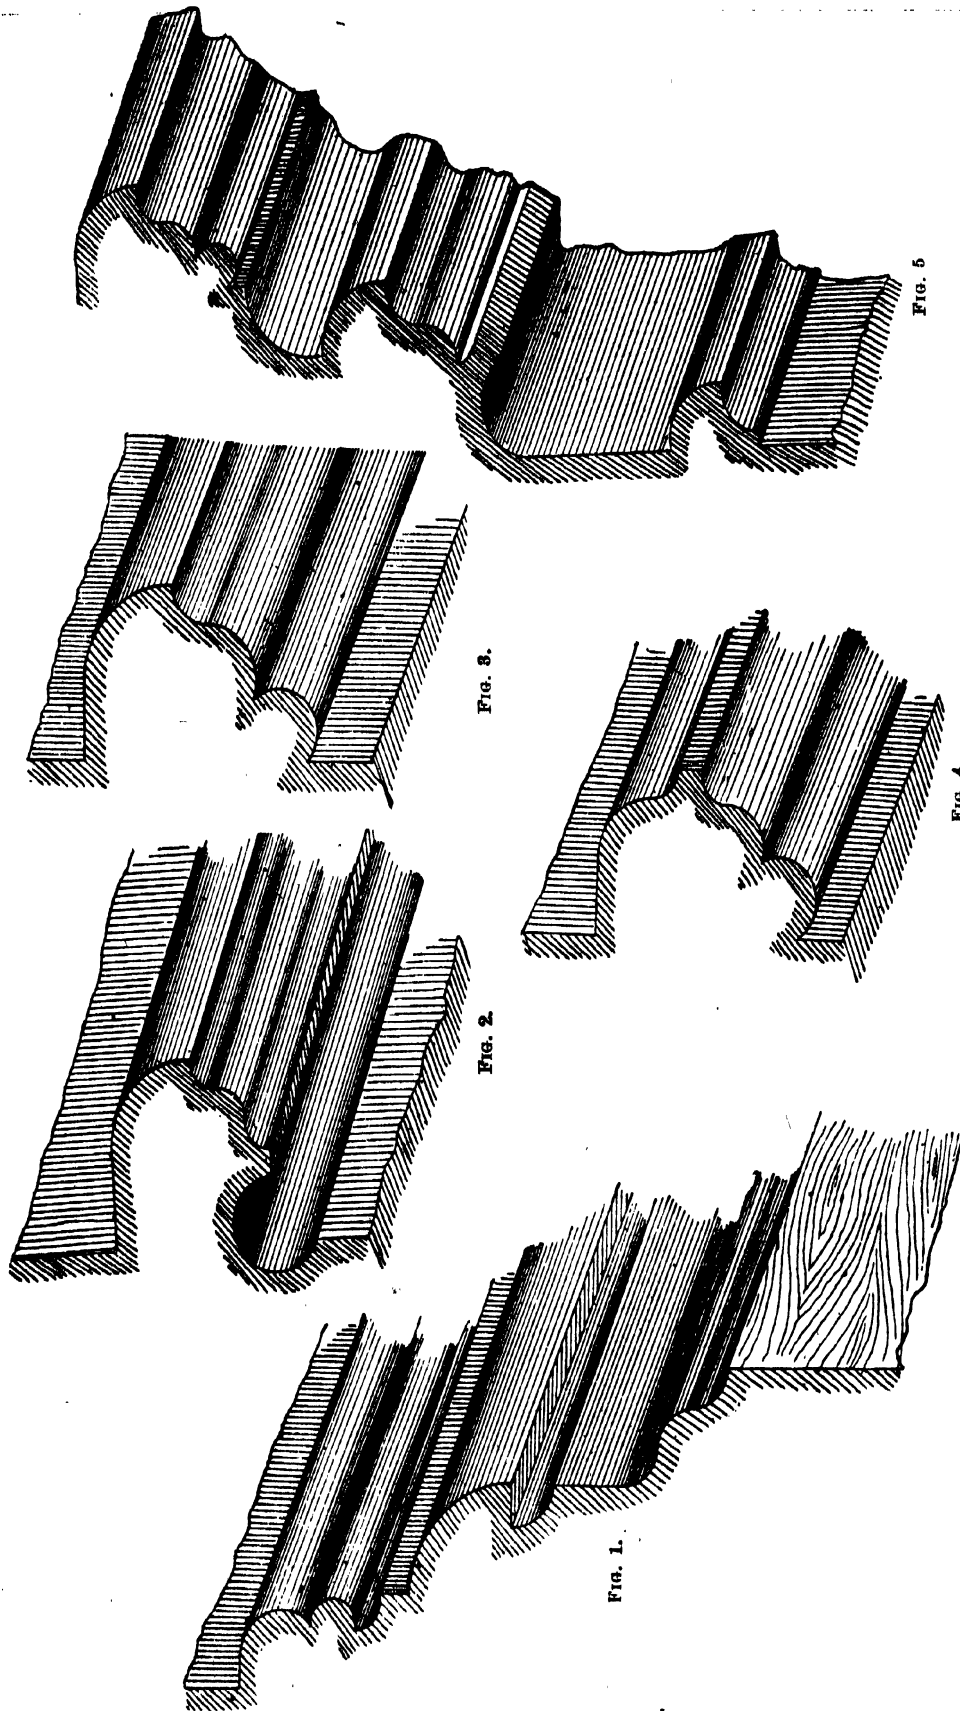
BASE MOULDINGS. FIG. 2, 3, and 4.—"STRING COURSES." FIG. 5.—CORNICE, OR "CAP" MOULDINGS.
